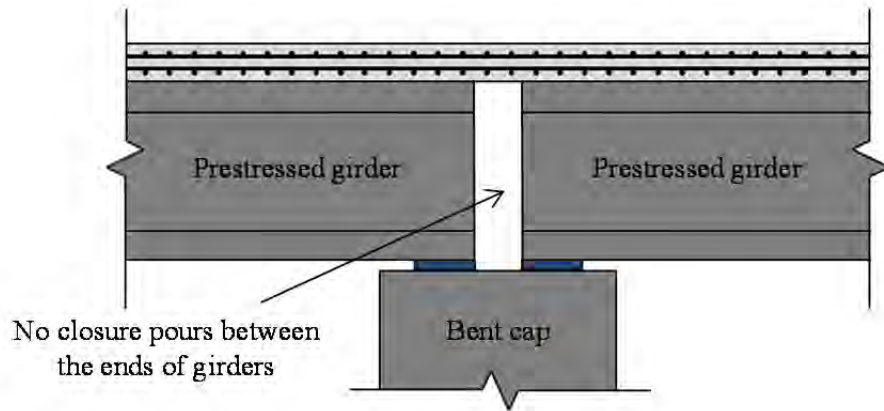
“Poor-boy” joint (adapted from Roberts et al. 1993)
